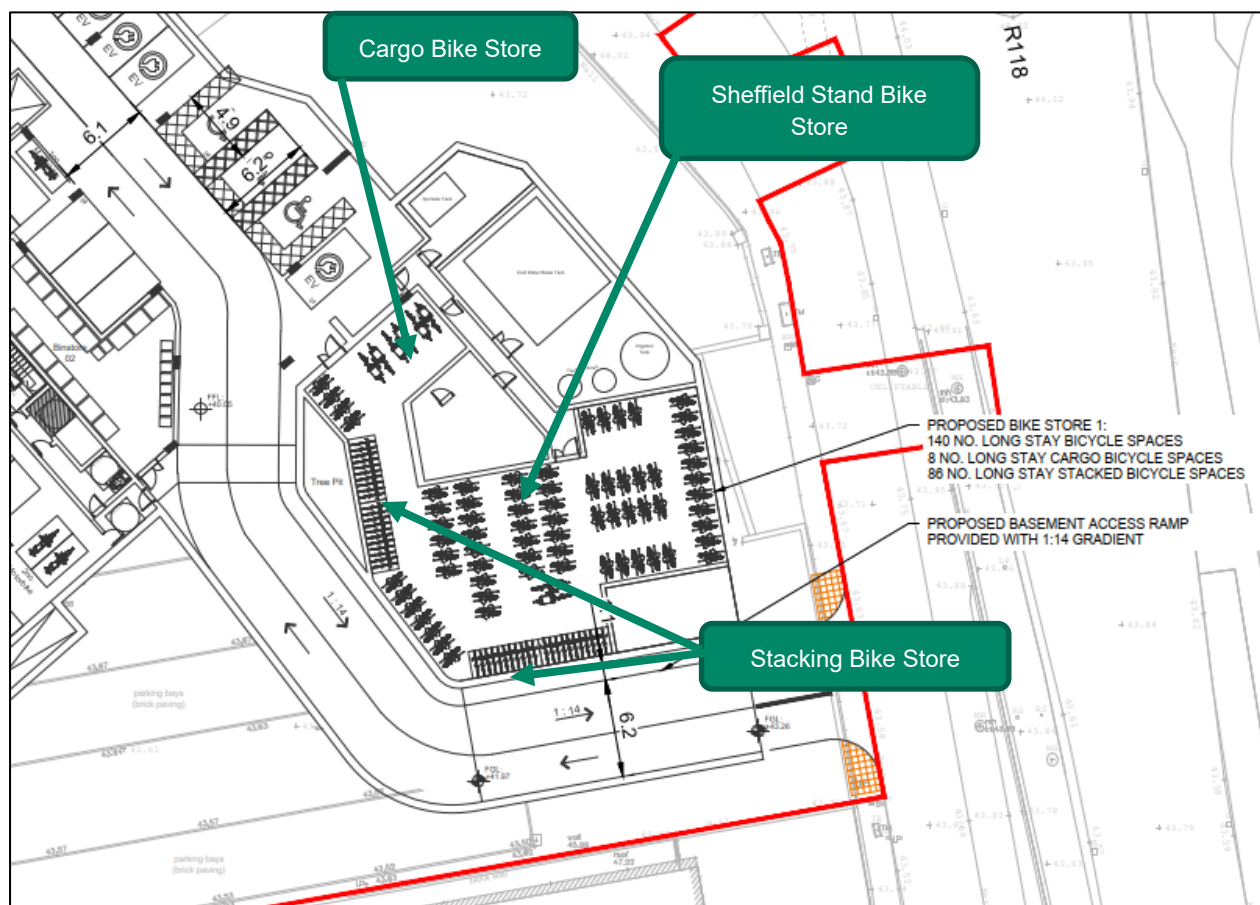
Proposed Basement Layout Cycle Store 1 (AECOM Drawing:60690914-ACM-01-00-DR-CE-10-0002)
